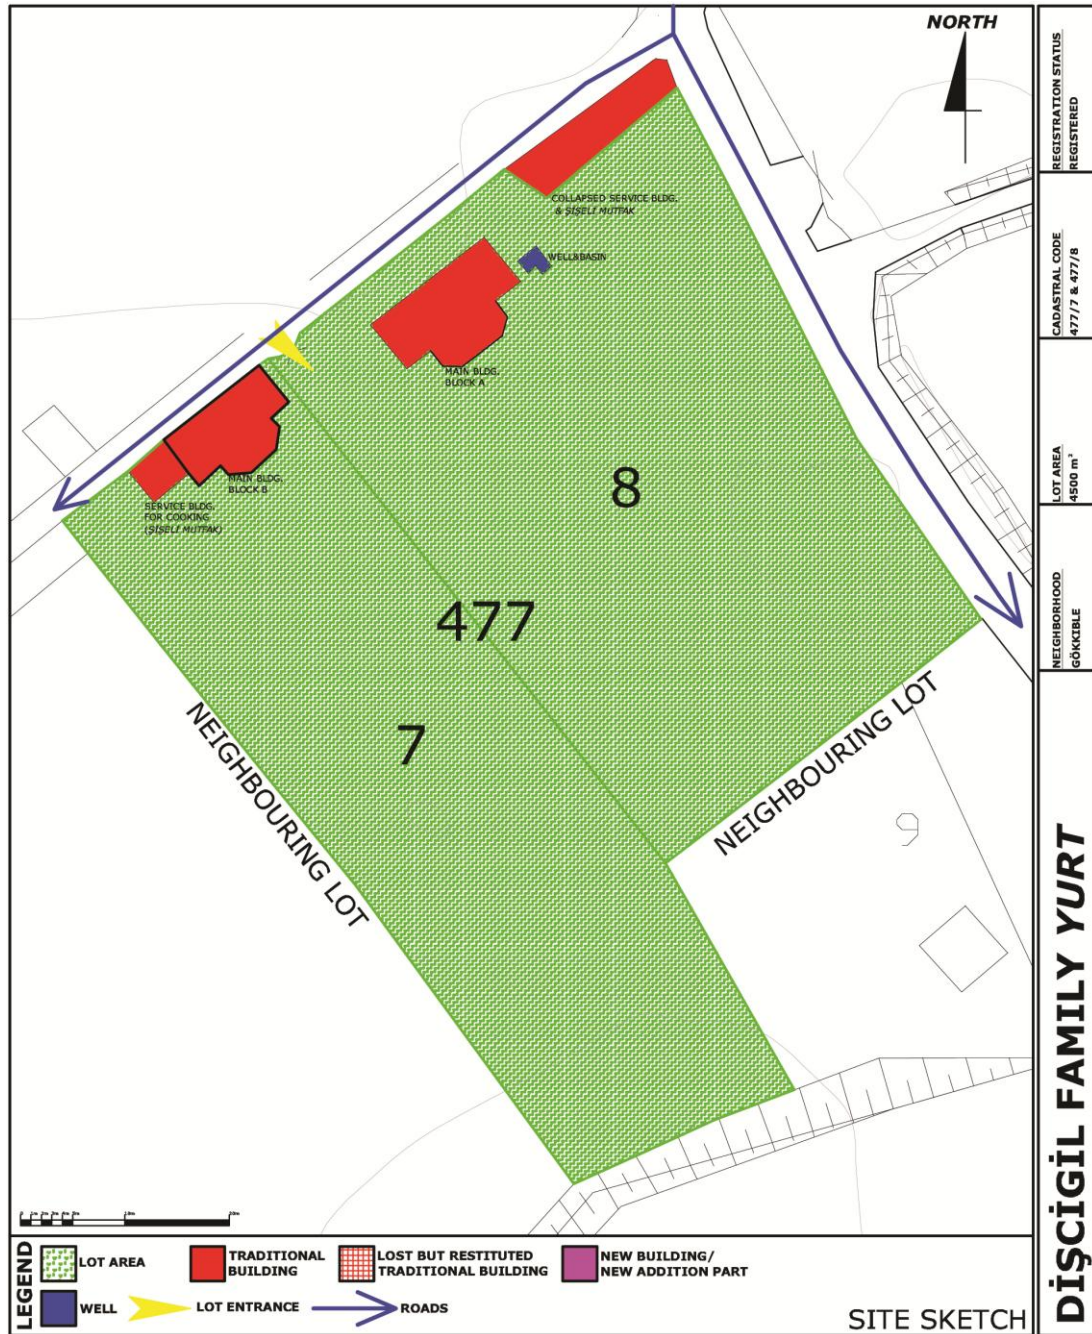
Site plan sketch of the *yurt* of Dişçigil Family
